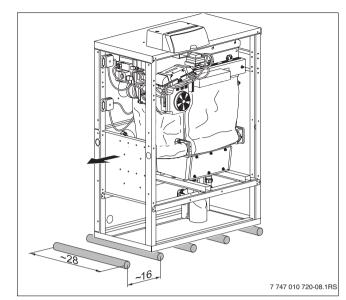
Transporting the boiler on rollers (dimensions in inches)
